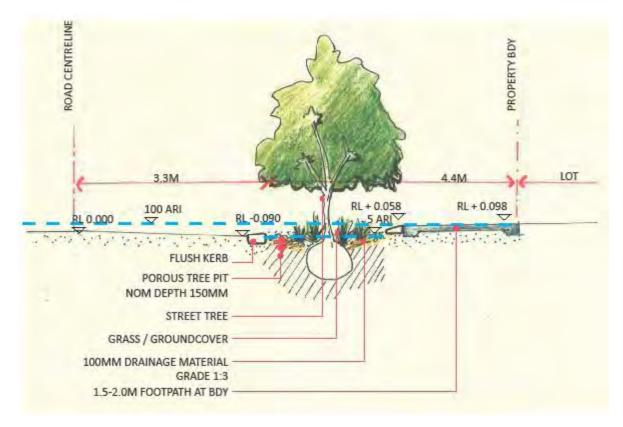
Typical half road section—with footpath (Scale 1:25@A3)
